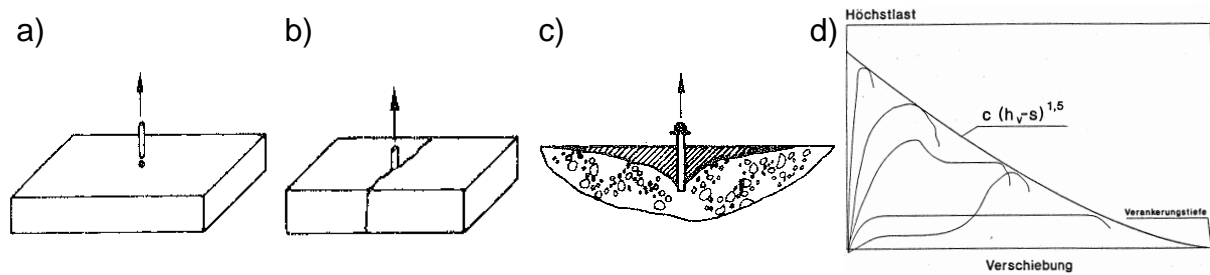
Tension failure modes (*Eligehausen, R.; Mallée, R. et al. (2006)*): a) Steel failure; b) Concrete failure; c) Splitting; d) Limitation of anchor capacity in case of concrete failure (*Furche, J. (1994)*)
